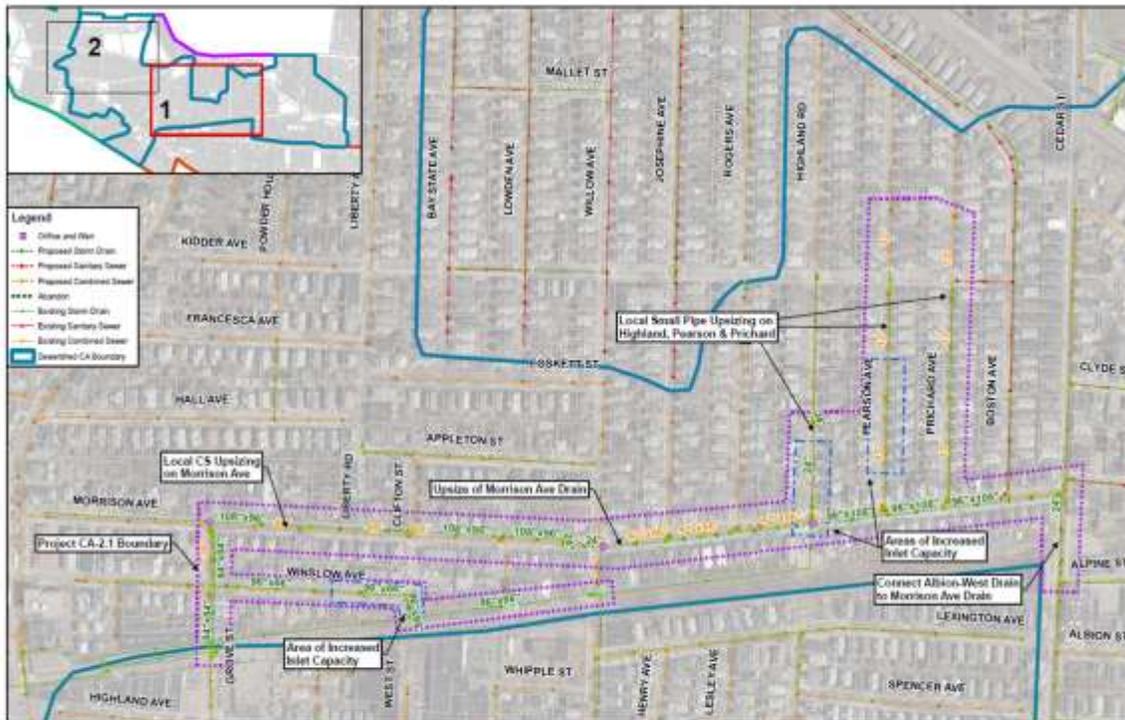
Project CA-2.1 Area - Proposed Improvements (Page 1 of 2)
